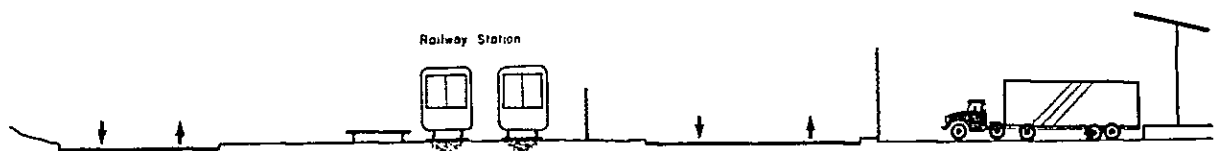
EXISTING CROSS SECTION OF VIA CERRO ANCON(1)
